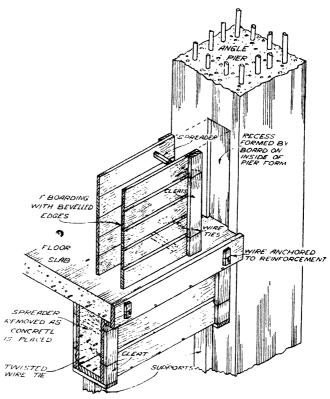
Detail of forms for lintel, edge of floor slab and wall panel at a in fig. 1
